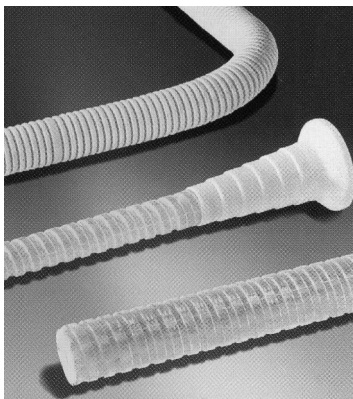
GFRP reinforcement bars (Schöck 2004)
